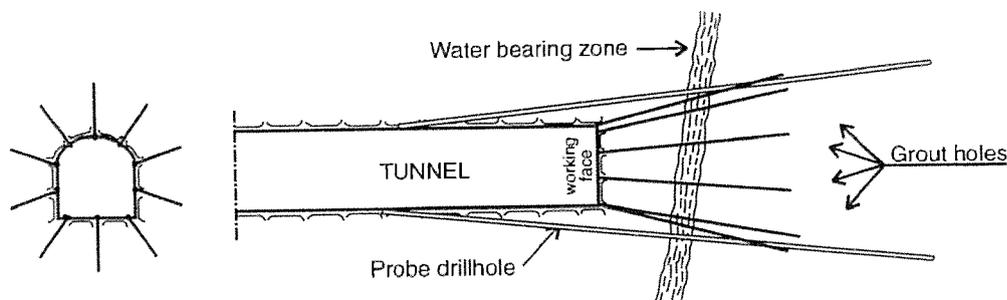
A typical scheme for pre-grouting ahead of the tunnel face
